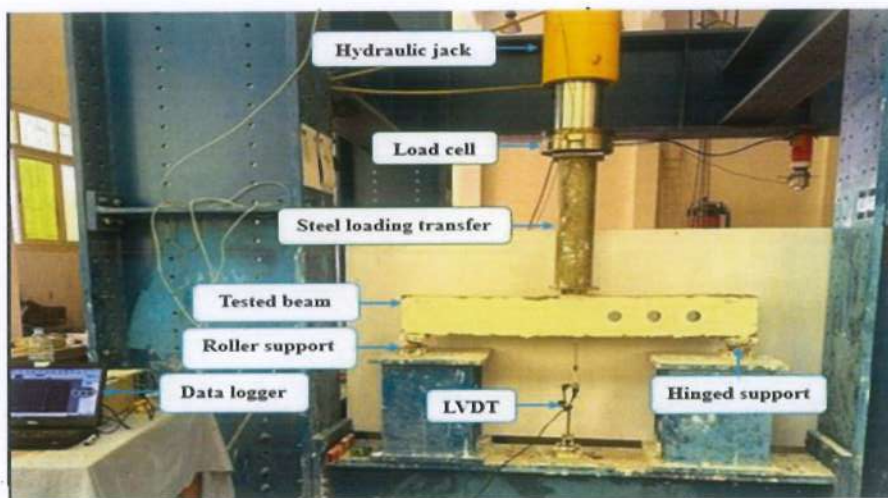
Test Set-Up of Reinforced Concrete Beam with Openings [33].
